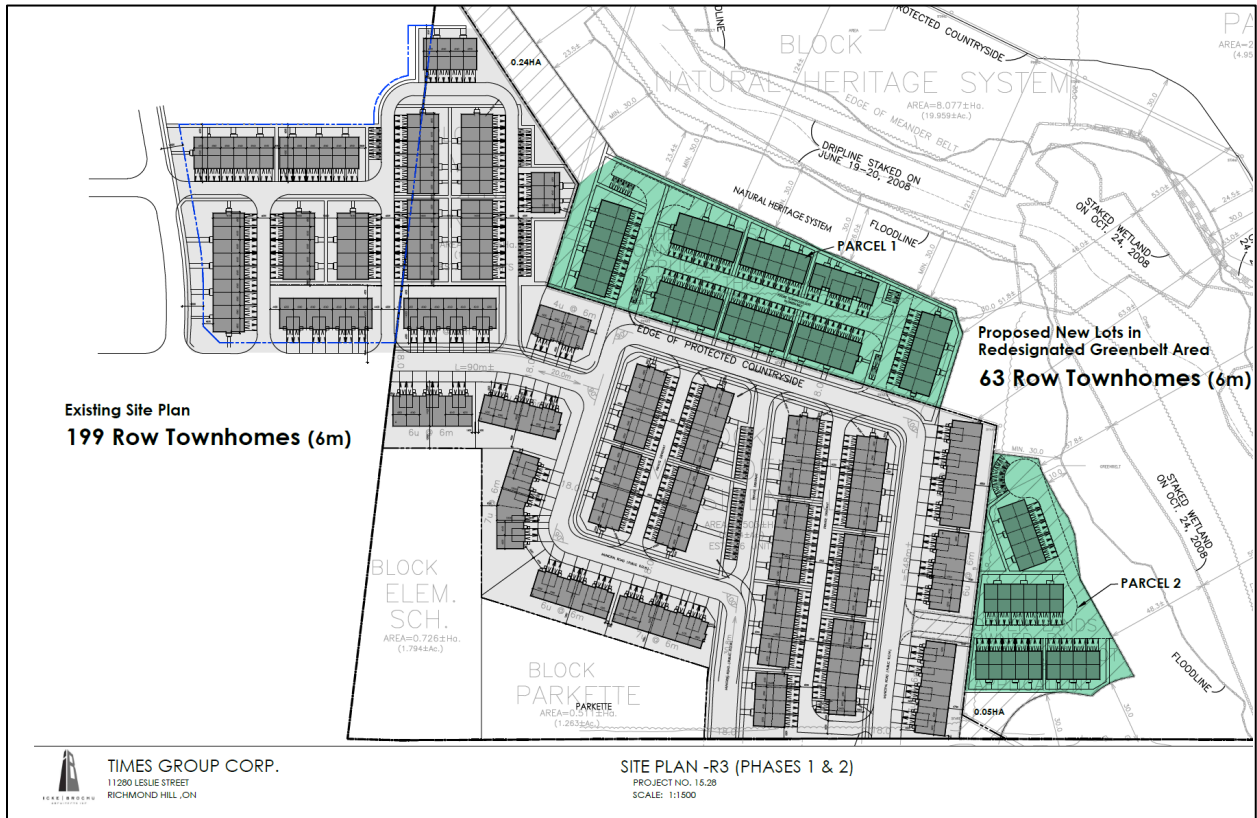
Icke Brochu Site Plan depicting the layout of 63 Net New Townhomes in previously designated Greenbelt Areas at 11280 Leslie
